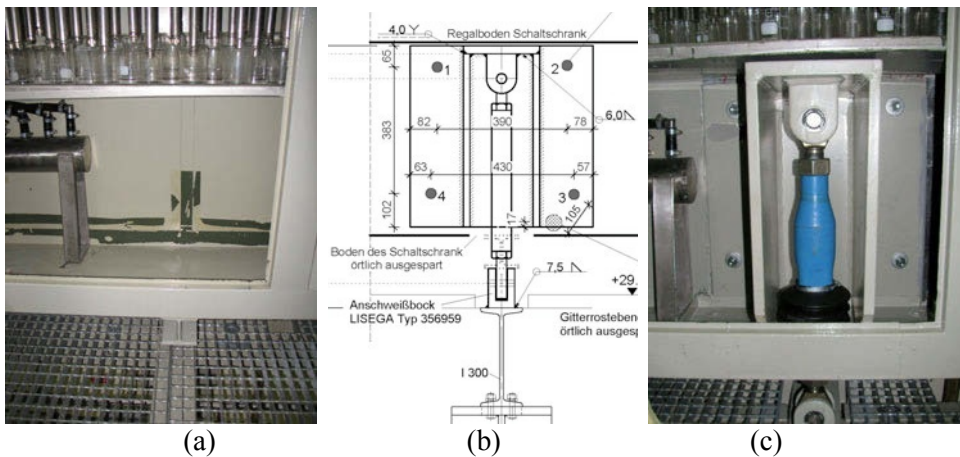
(a) proposed location of new anchor plate within a control cabinet (b) anchor plate design (c) completed anchor plate at the proposed location
